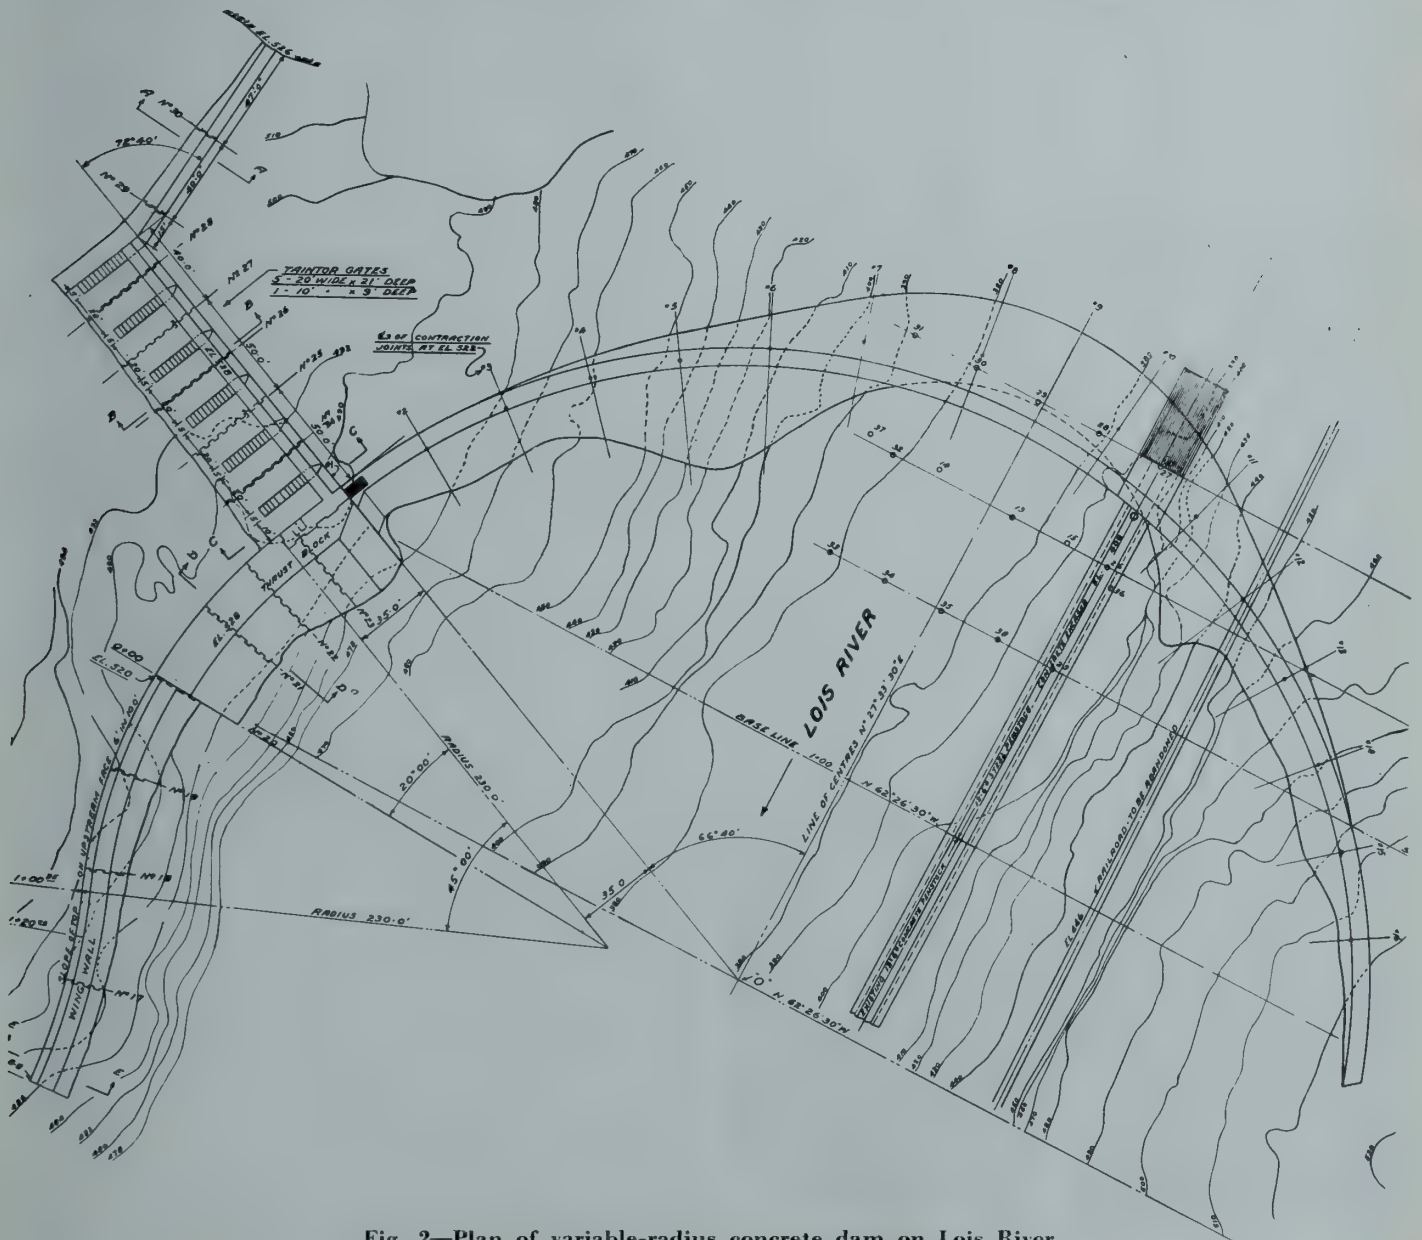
Plan of variable-radius concrete dam on Lois River showing layout of dam and wing wall.
